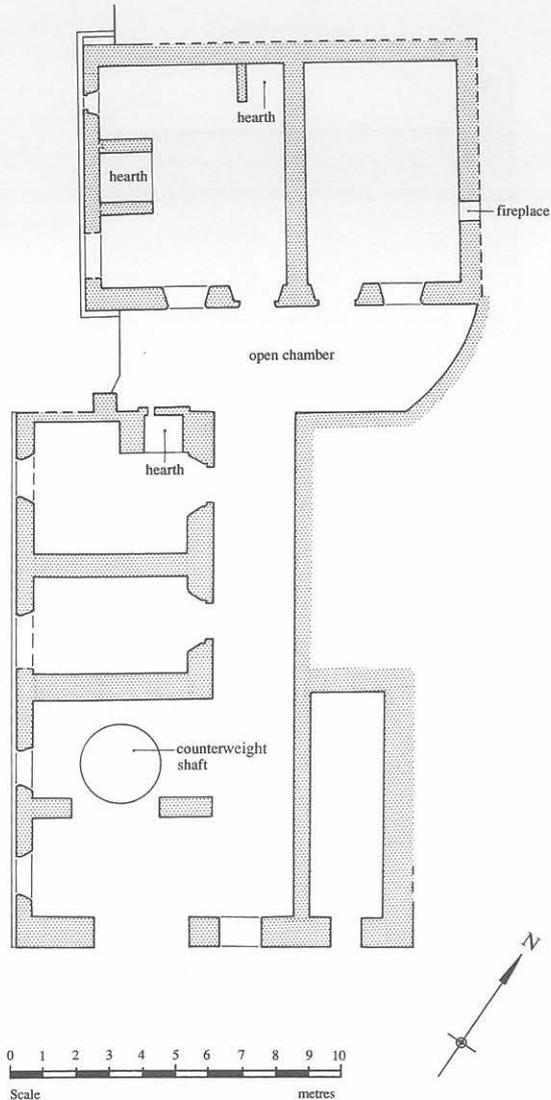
Plan of the chambers below charging level in the north and south charging houses.
